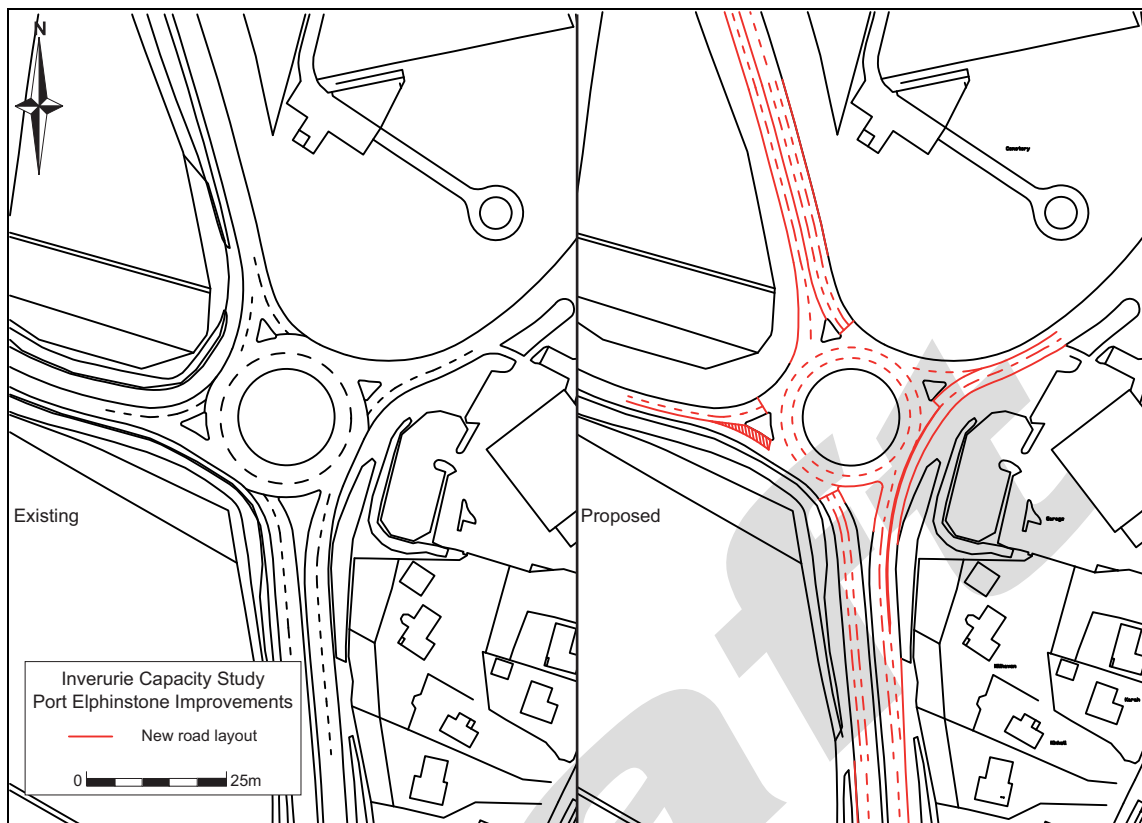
Proposed Port Elphinstone Upgrade compared to existing layout
